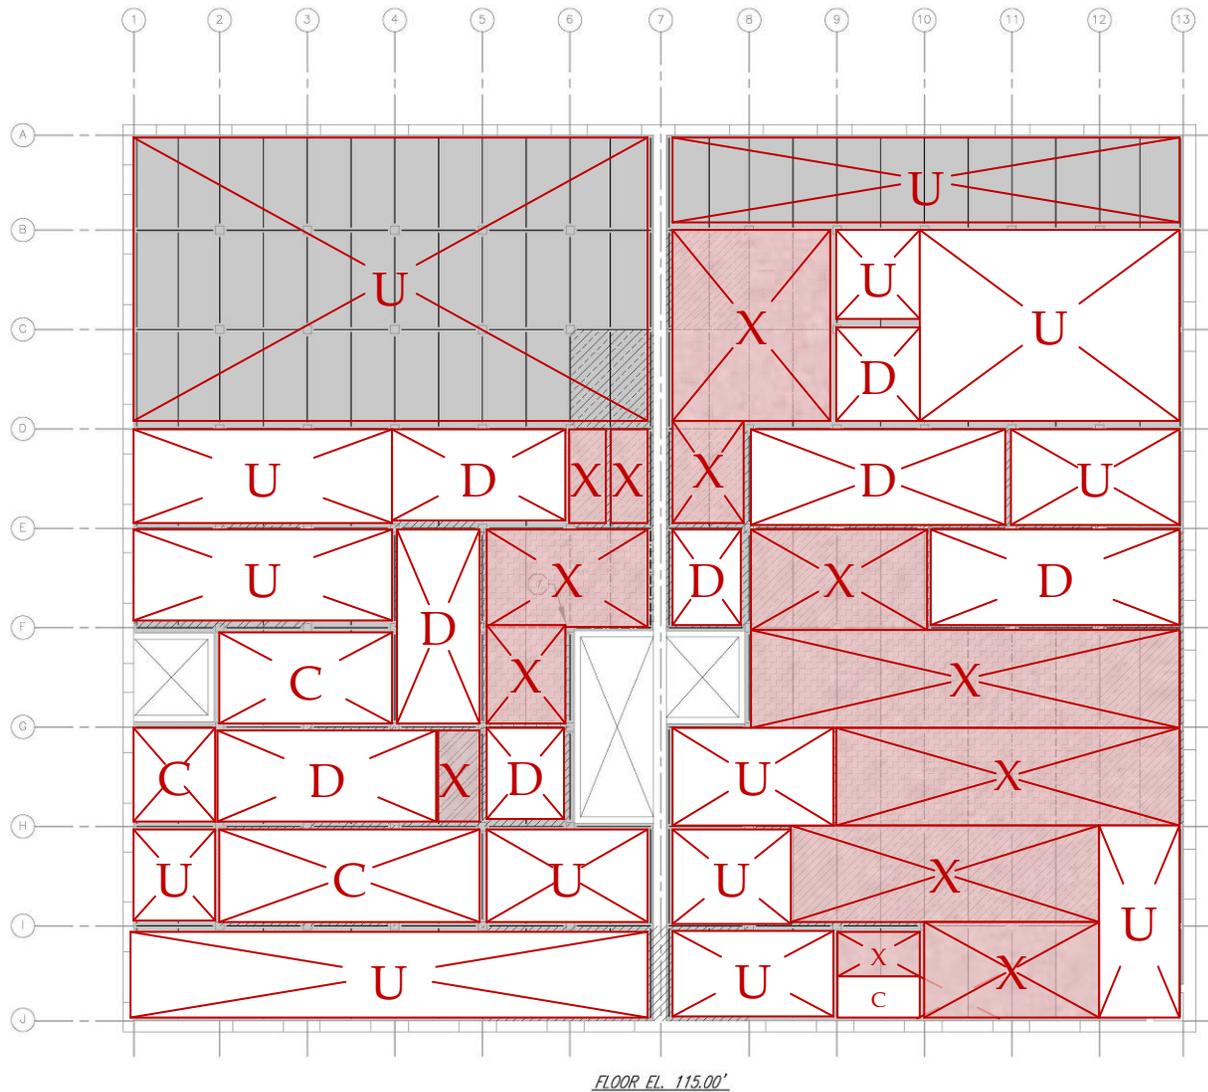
First Floor Framing Plan - 2000 and 2011 (red)
